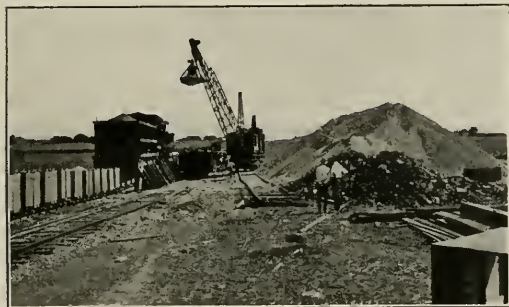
MATERIAL YARD, SHOWING ARRANGMENT OF LOADING BINS AND STORAGE PILE
